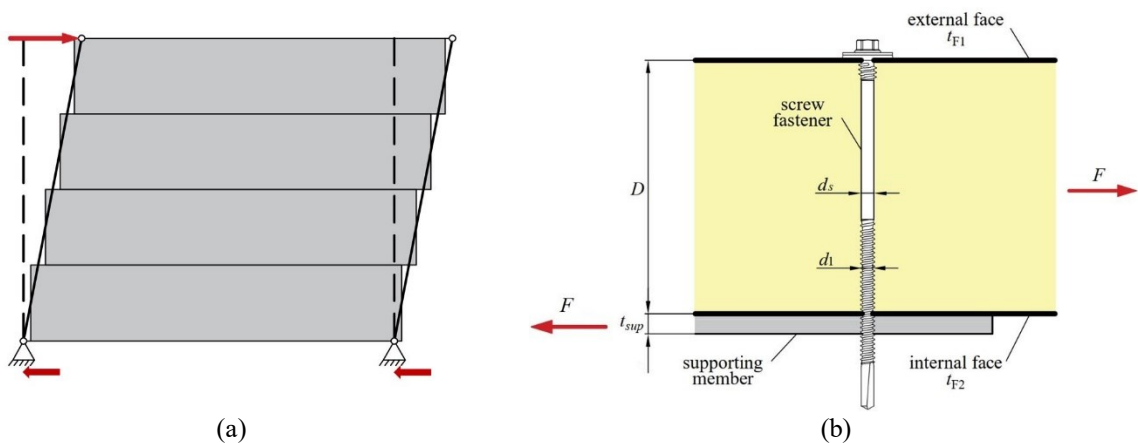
a) deformation of unidirectionally spanning sandwich panels, b) sandwich panels under shear loading
